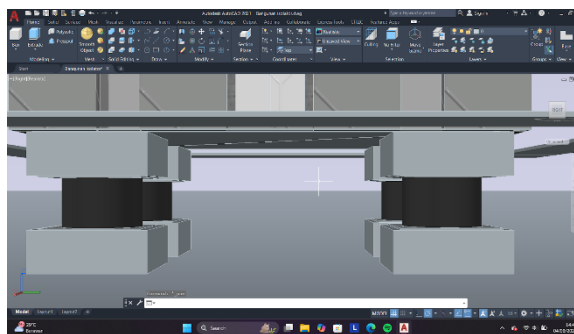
Installation of SEISPRING Prototype Beneath Building Structure
